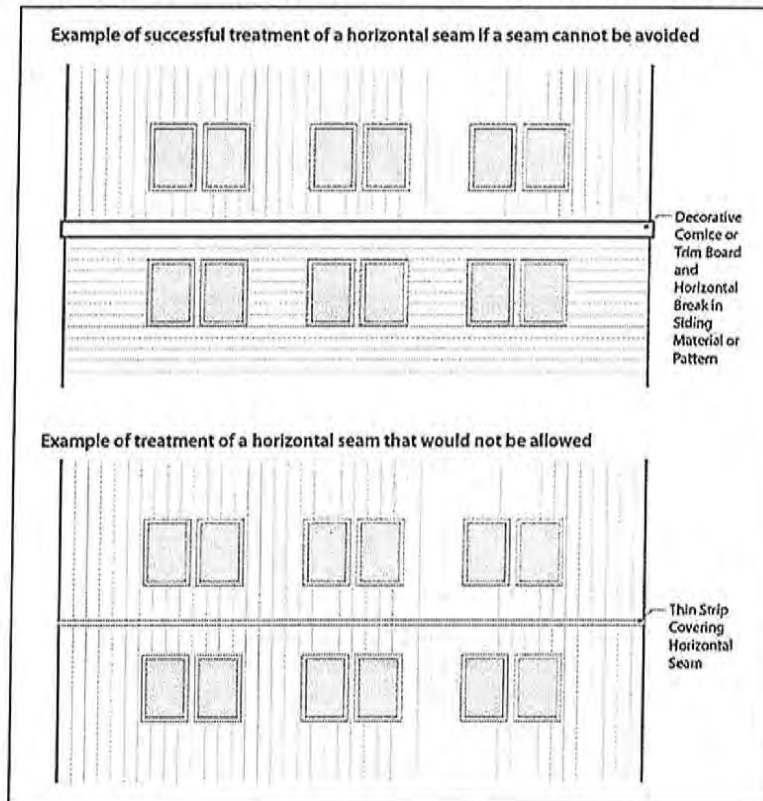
Exterior Walls – Horizontal Seam Treatment
